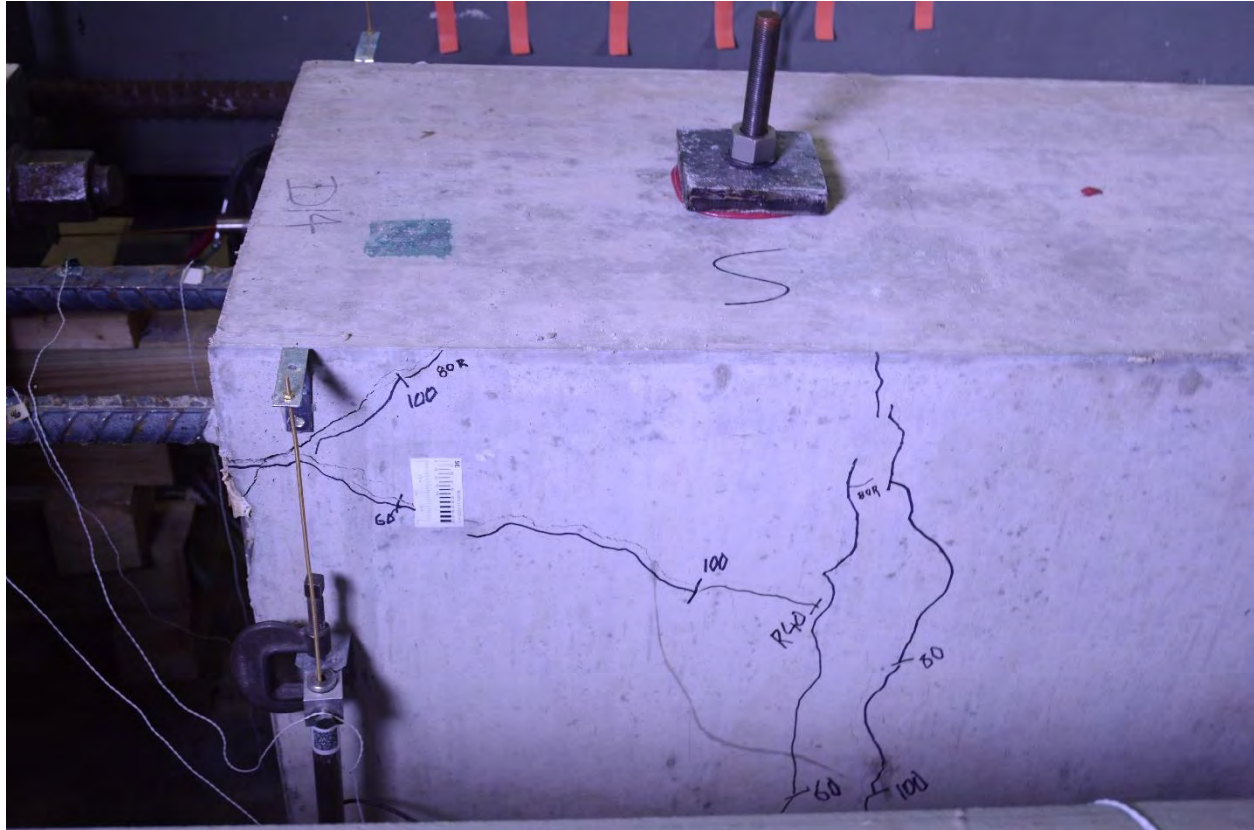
Test Photo Specimen D14, SE corner, 120 kips
